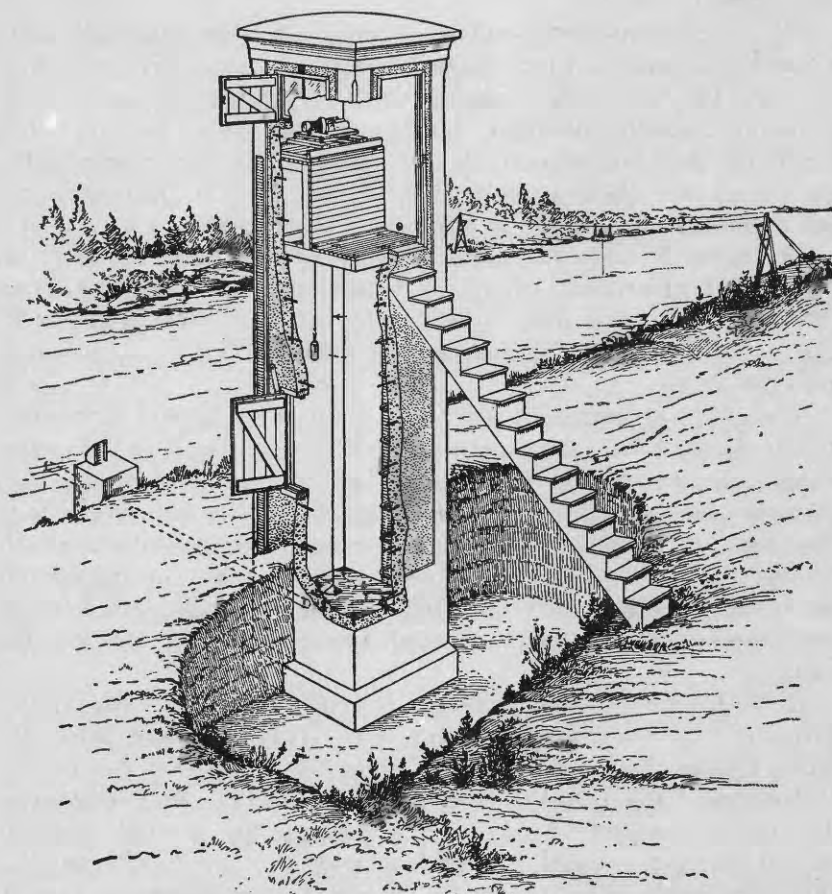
Typical river-measurement station showing concrete well and house for water-stage recorder and staff gages, cable, and car
